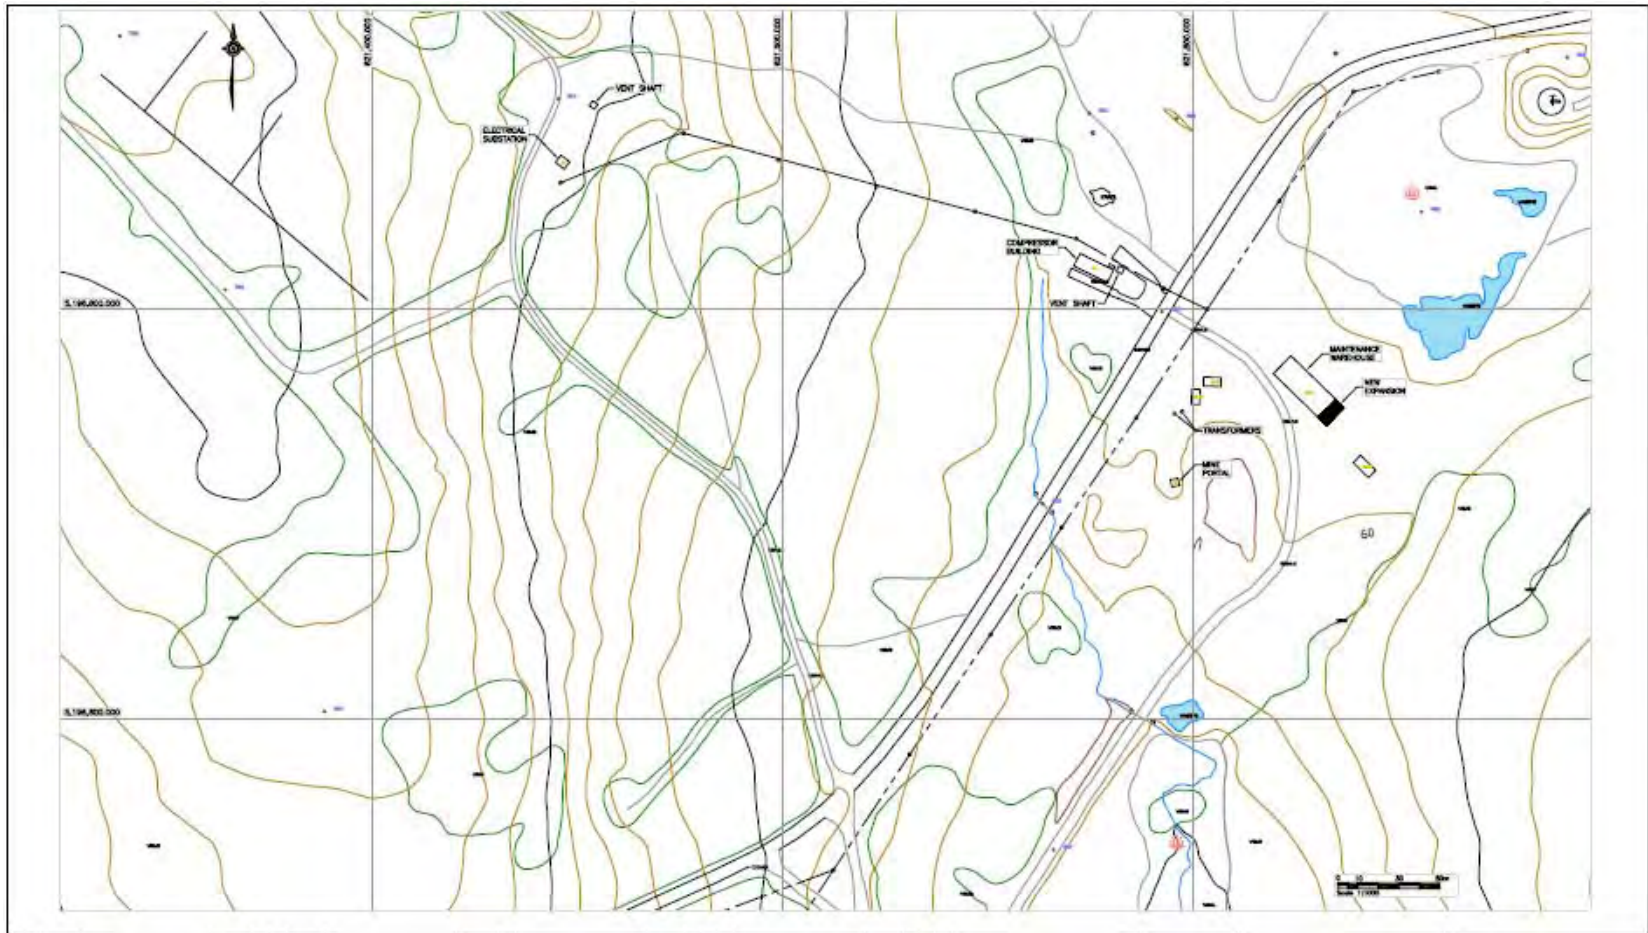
Blue Beach North Mine Site Location Plan
